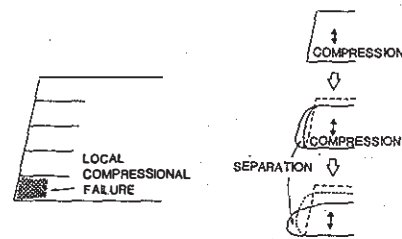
Local compressional failure of soil by using a flexible facing (Type A).
